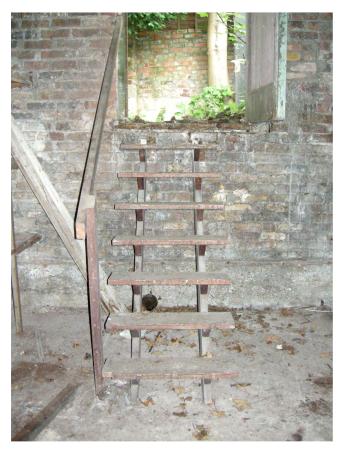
View from north-east of south-west wall of store in north corner of 6 Streatley Place showing depth of floor below ground level (MOLA Photo 16.06.2014)
